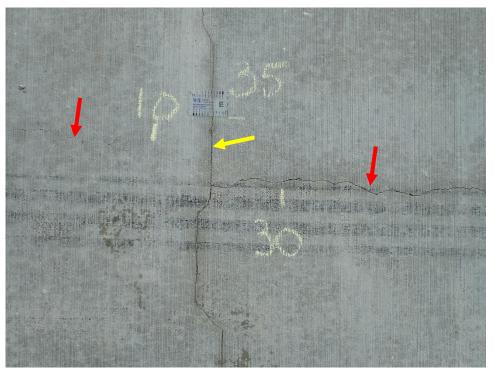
Close-up photo of a transverse crack (yellow arrow) and longitudinal cracks (red arrows). Numbers in yellow chalk indicate crack widths. (Middle panel in Patch No. 3).
